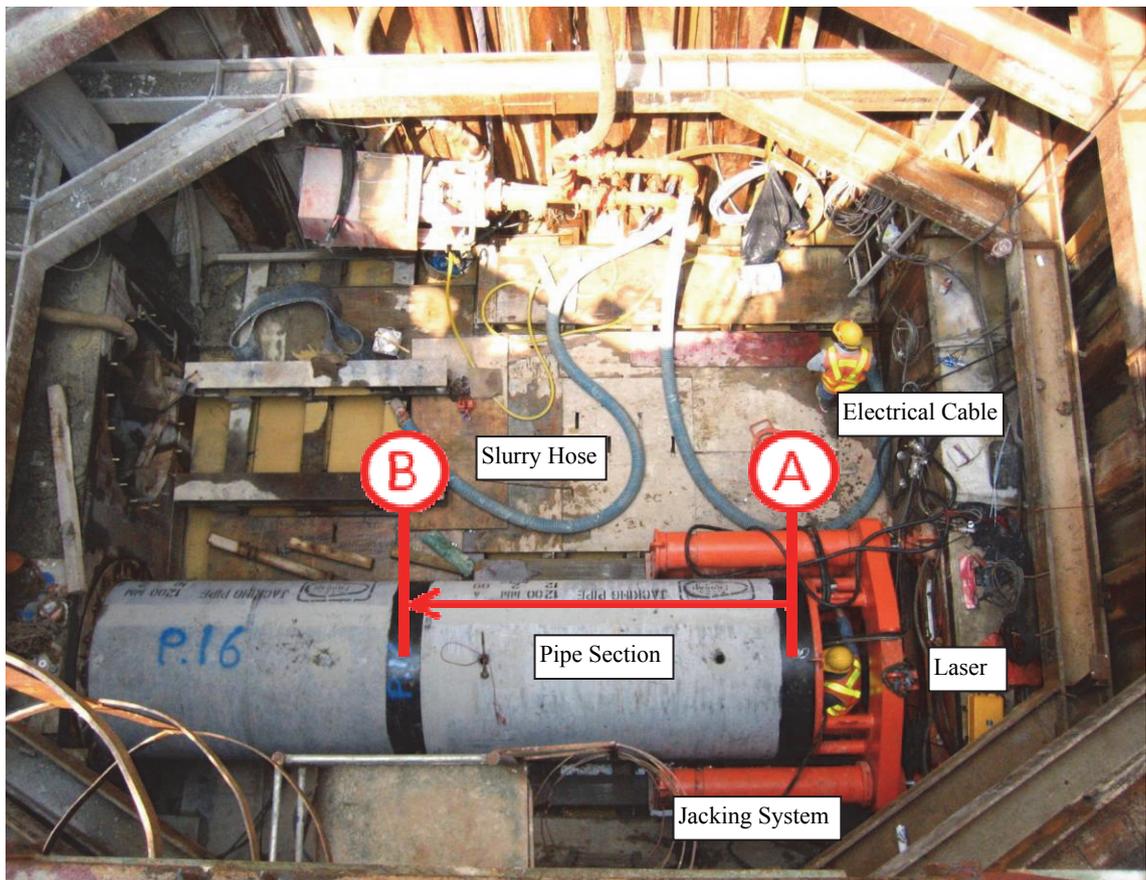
Jacking Pit Layout of So Kwun Wat Microtunneling Project
